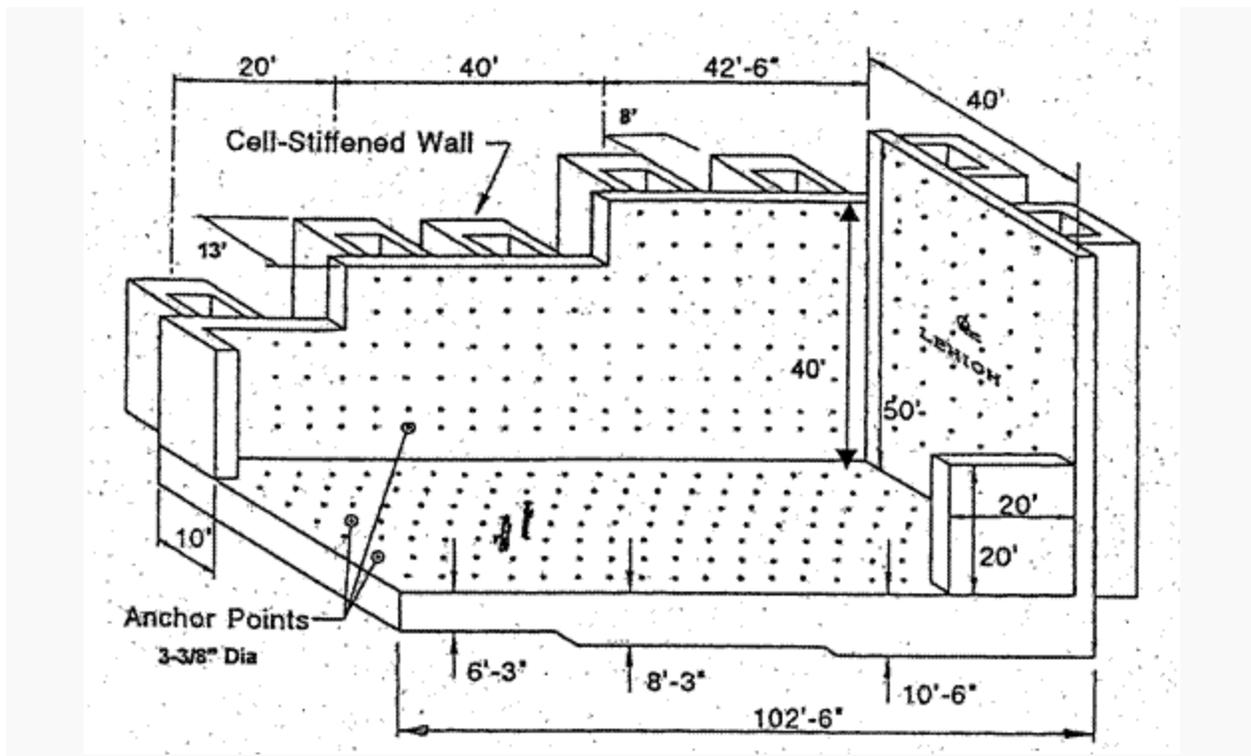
Multi-directional reaction wall and strong floor - isometric view
